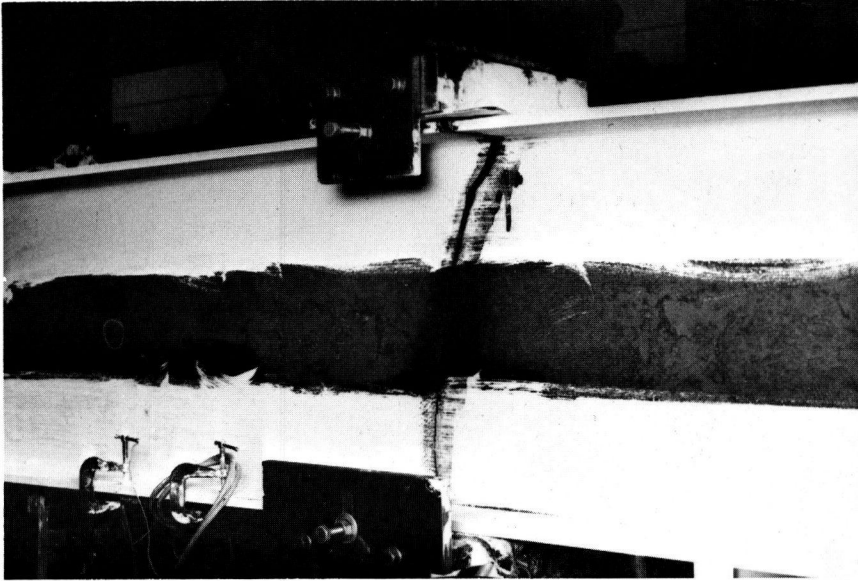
Failure crack that initiated in the compression flange at edge of loading plate.
